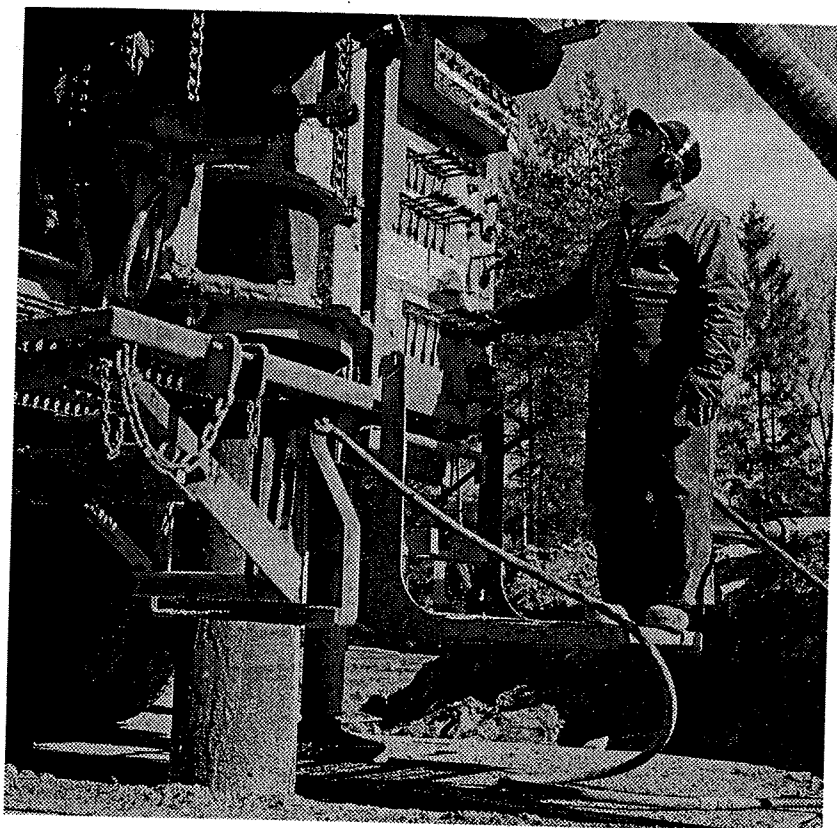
Installation of large diameter drilled piles at the piling site of Tunnelipuisto Underpass.
